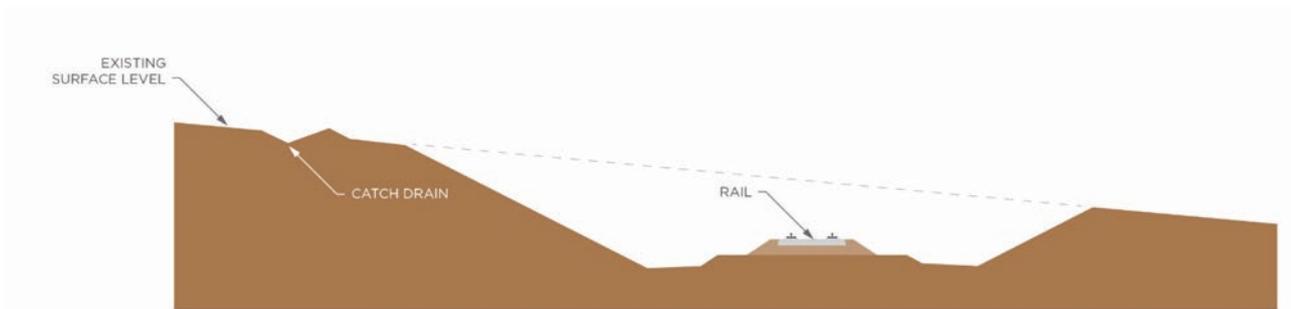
TYPICAL LONGITUDINAL DRAINAGE FOR RAIL FORMATION WITHIN A CUT
